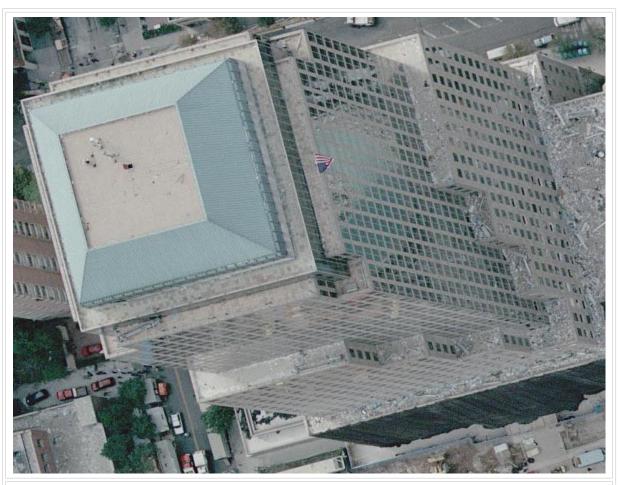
WFC2 had only pulverized dust and WTC aluminum cladding on its roofs. WFC2 suffered only window damage only to its lower floors, despite the destruction of a 1/4-mile high building across the street. (9/23/01) Source: USGS/NOAA
